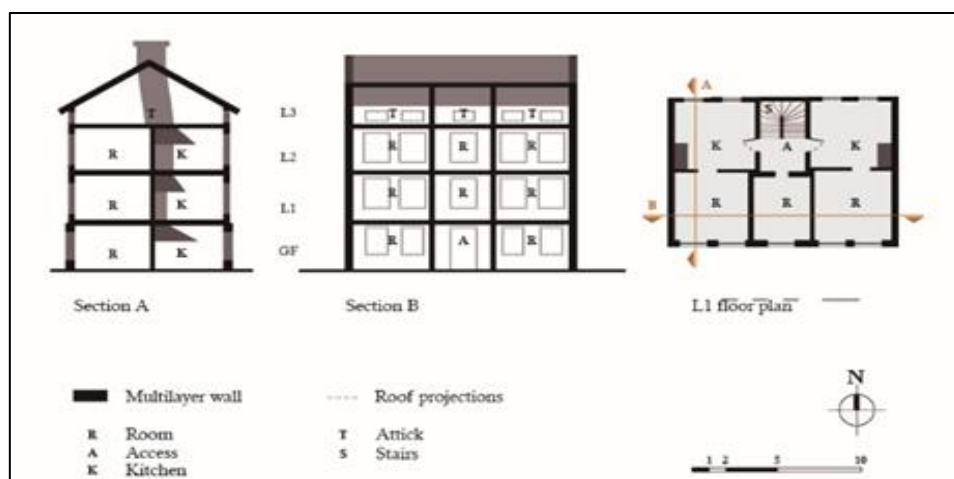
Plan and Section of Identified Vernacular Building at Latitude 57.7°N (24)
